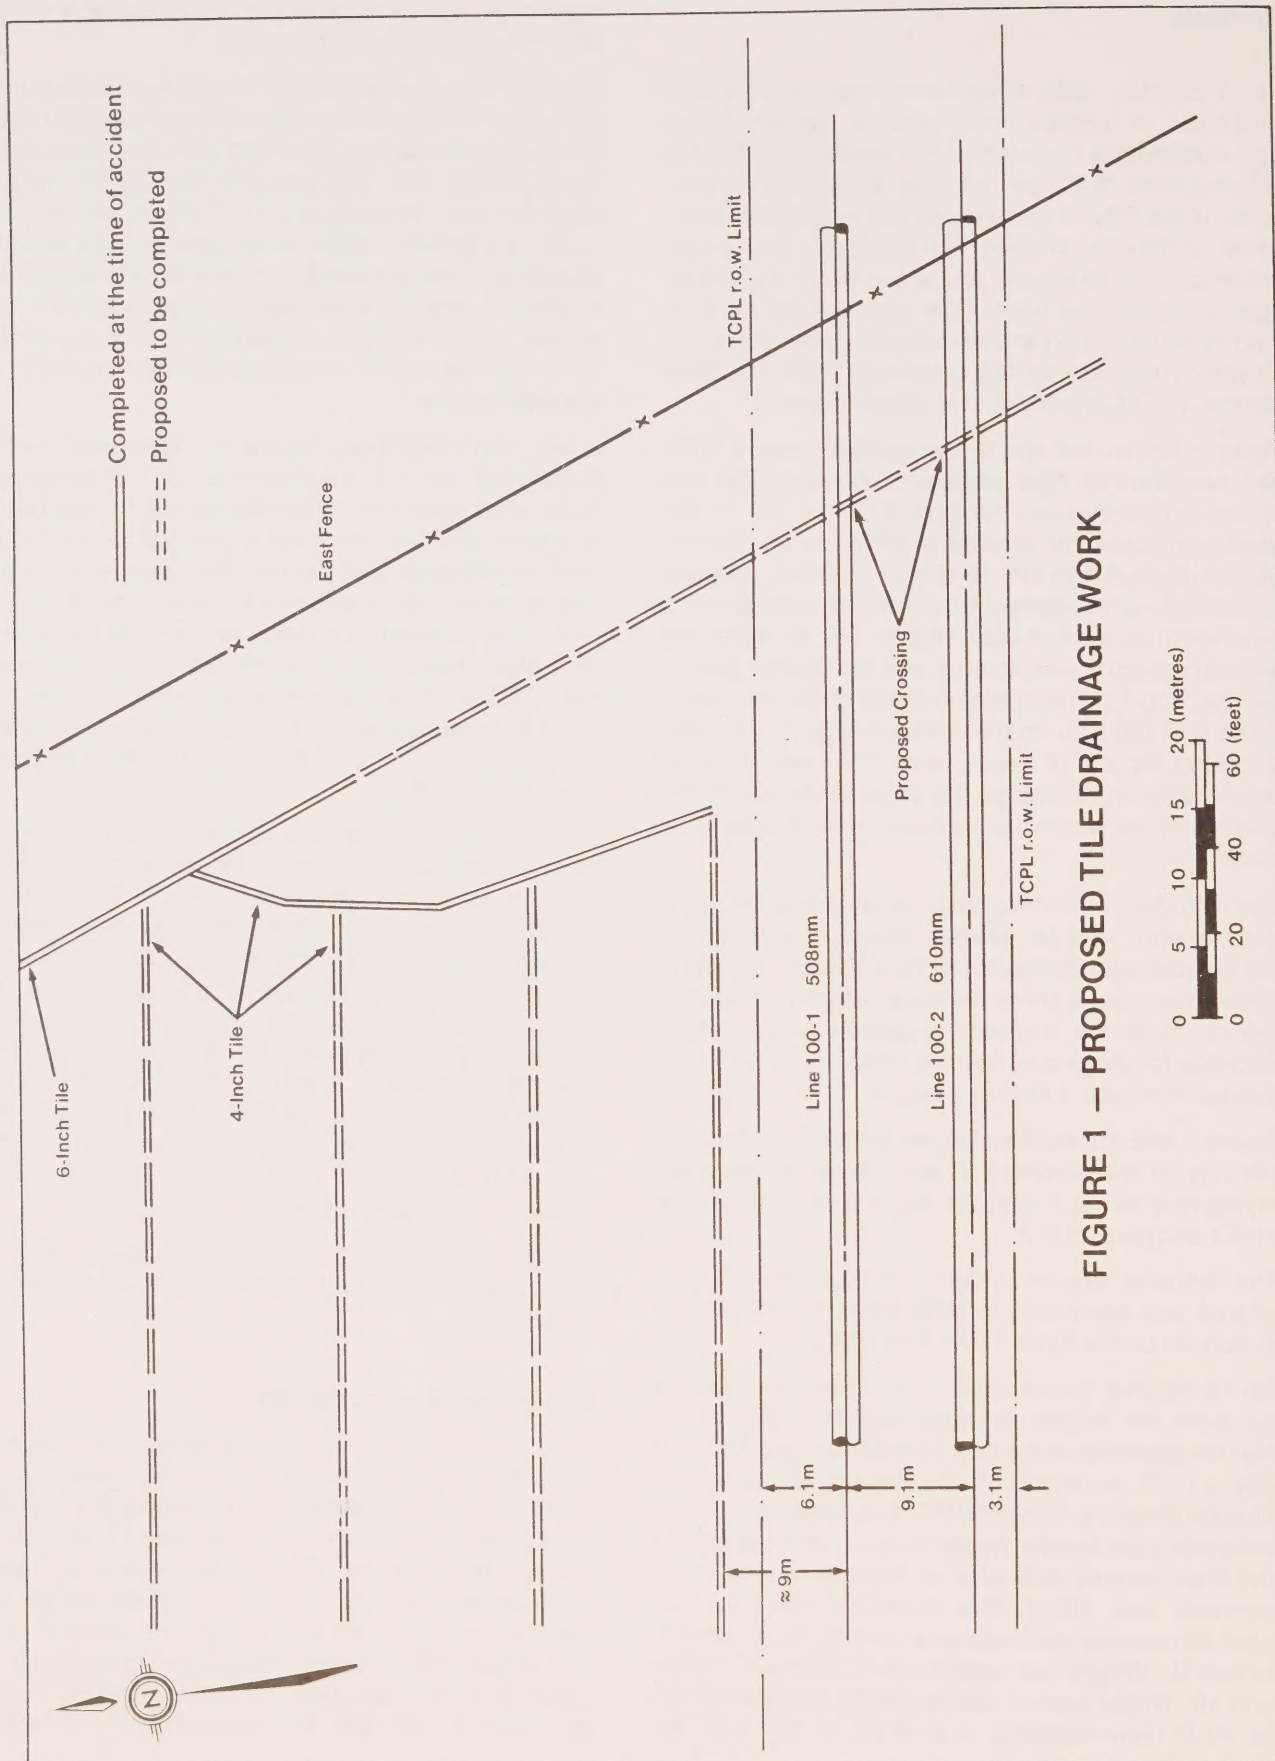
PROPOSED TILE DRAINAGE WORK
